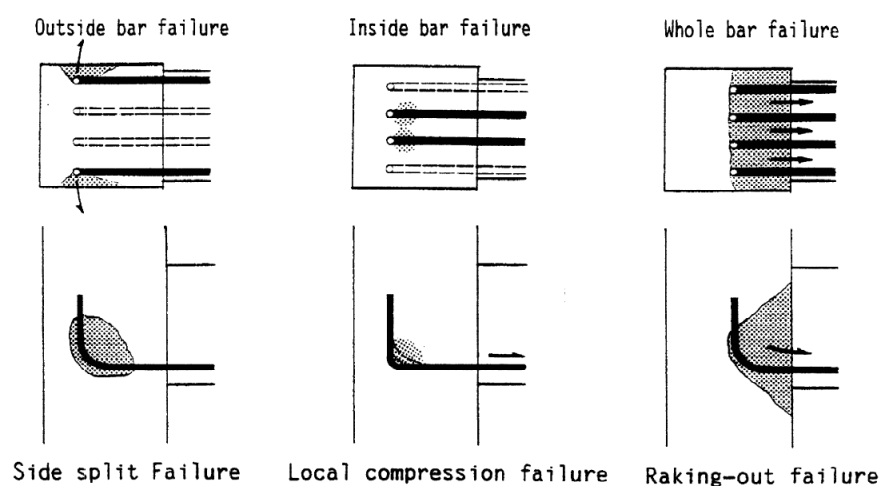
Hooked anchorage failure modes (from Joh and Shibata 1996)
